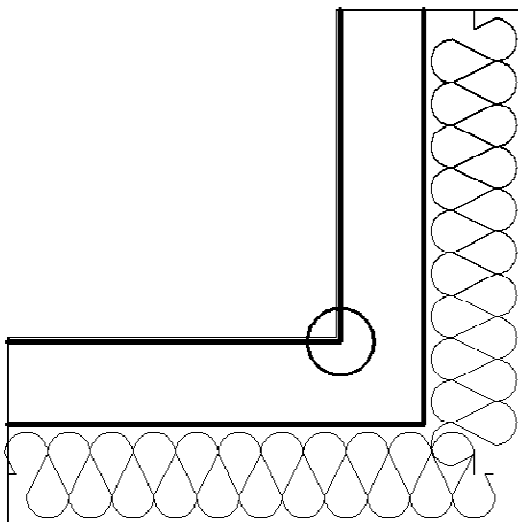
Location of the Thermal bridge in the exterior wall corner.
